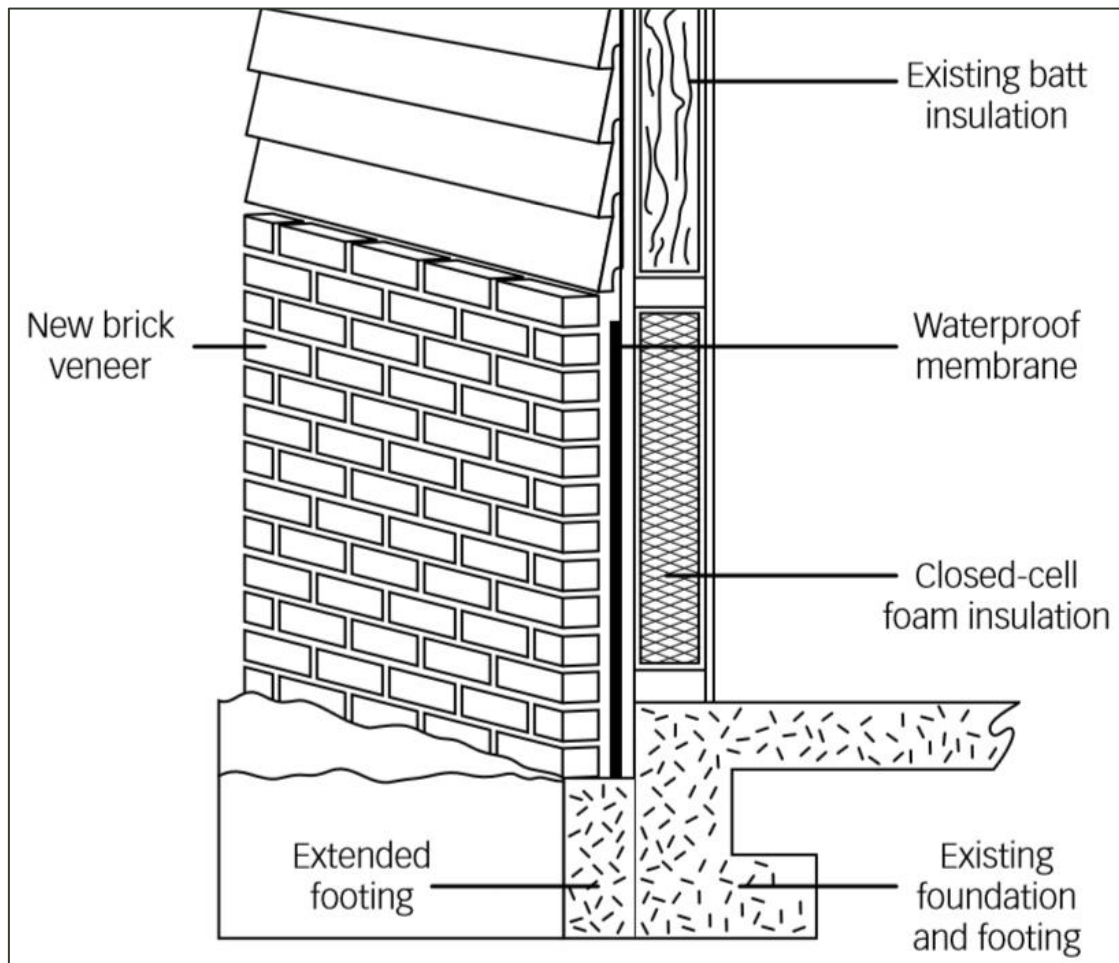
Reinforced cladding (Lloyds, 2008)
